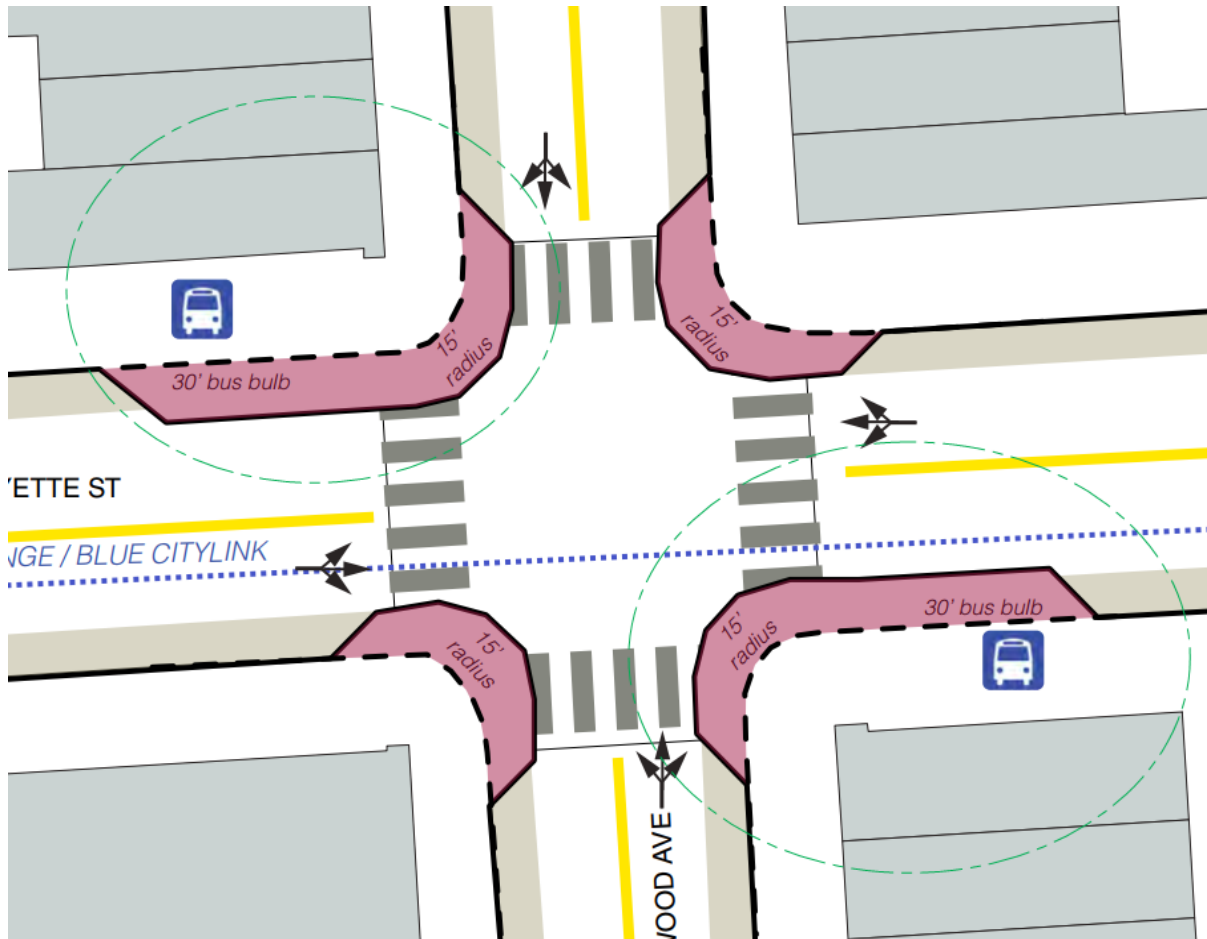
Concept Plan of Bumpouts & Bus Bulbs @ Fayette/Montford
